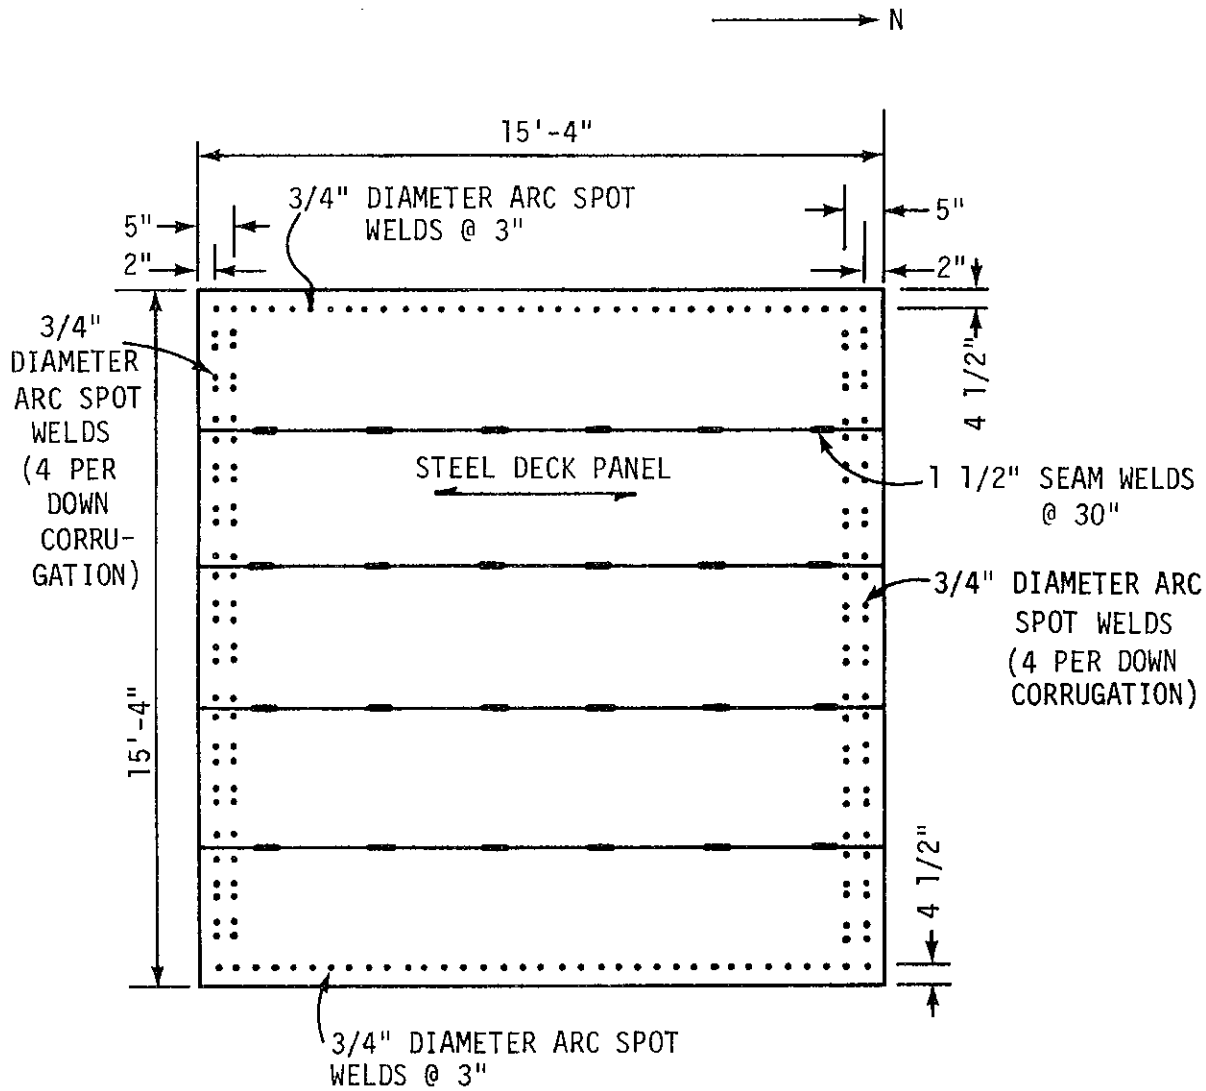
Plan view of edge fastener layout for Slabs 3, 4, 7 and 9 (Note: decking for Slab 4 is oriented 90 degrees to direction indicated.)
